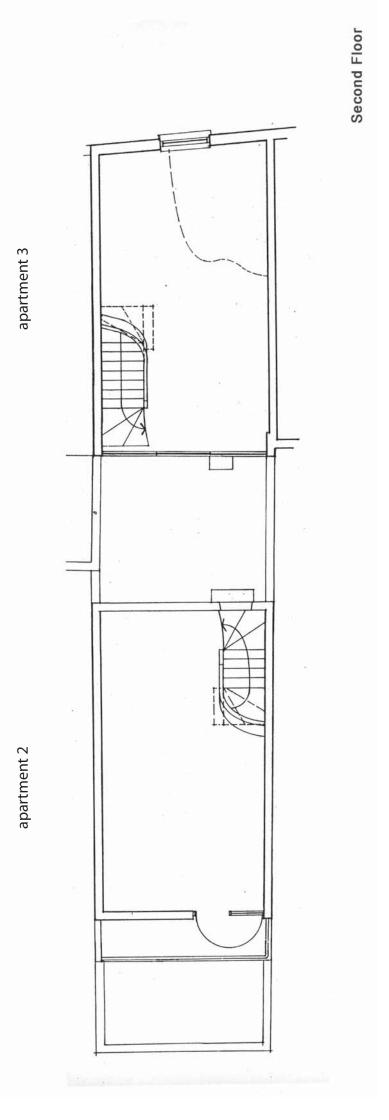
Second Floor plan of Doris's Place, with balcony to rear apartment
